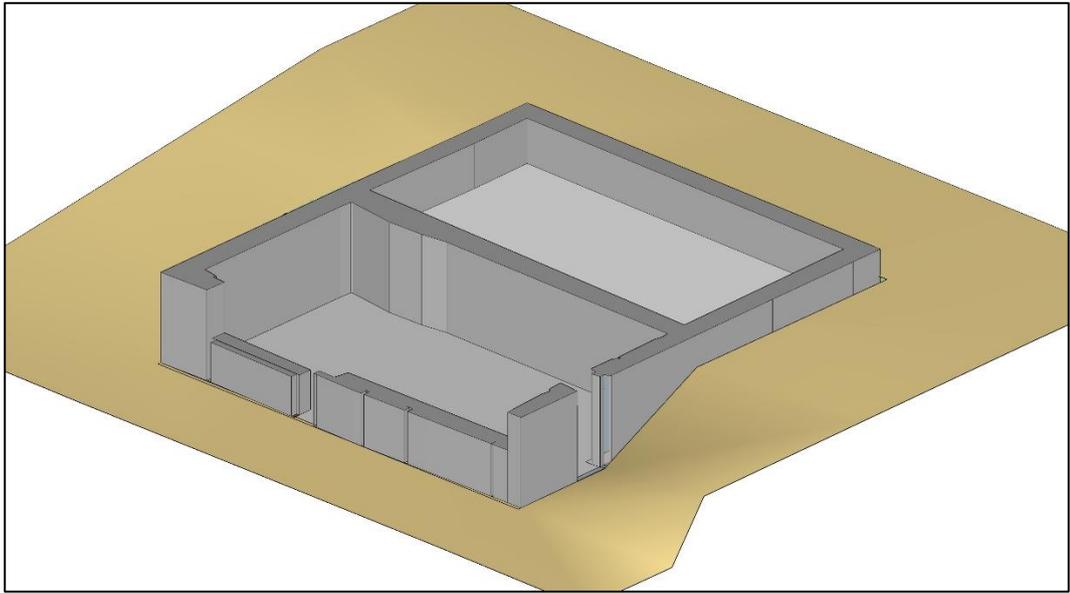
Masonry walls of the ground floor and foundation of Şenköy 3
